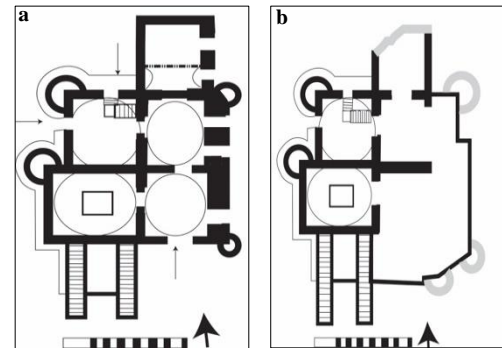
a. plan of PIR GAIB, ground floor, b. PIR GAIB, 2nd floor
